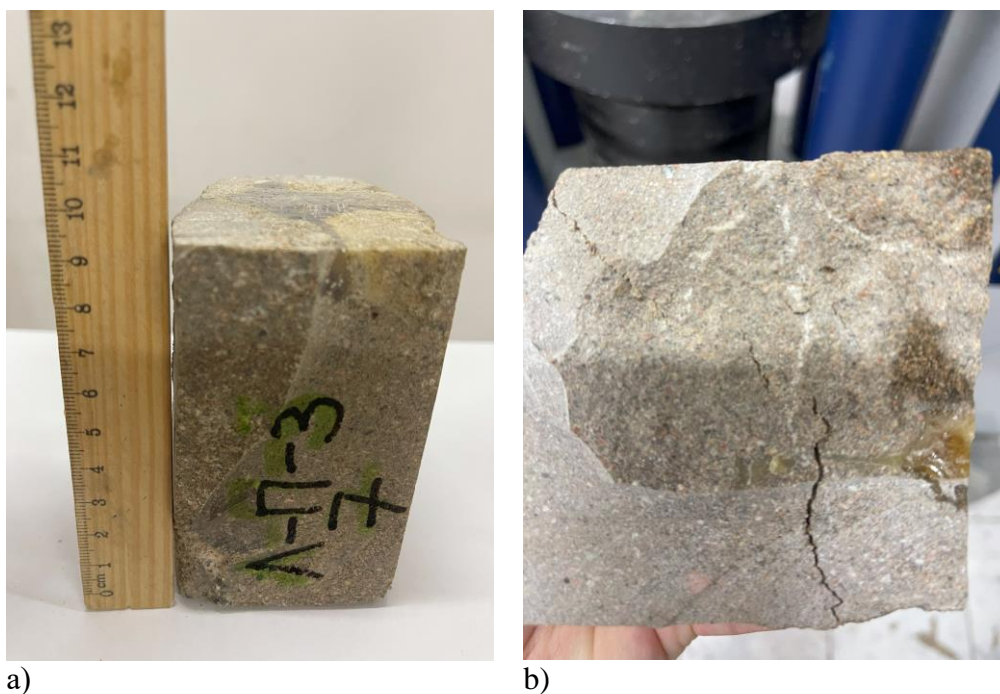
Tests of sand specimens: a) at the moment of testing and b) after testing them in compression (author's material).
